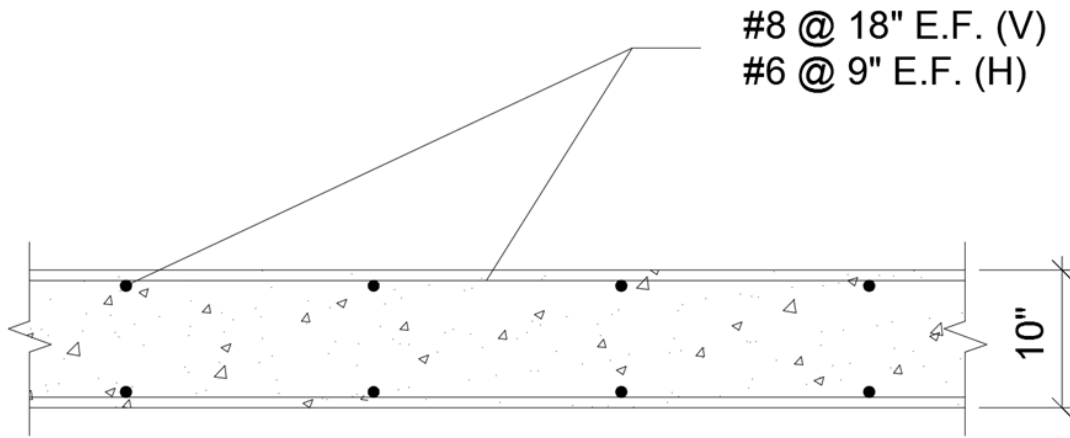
Segment of original exterior wall cross-section at the ground floor level based on SDC D design.
